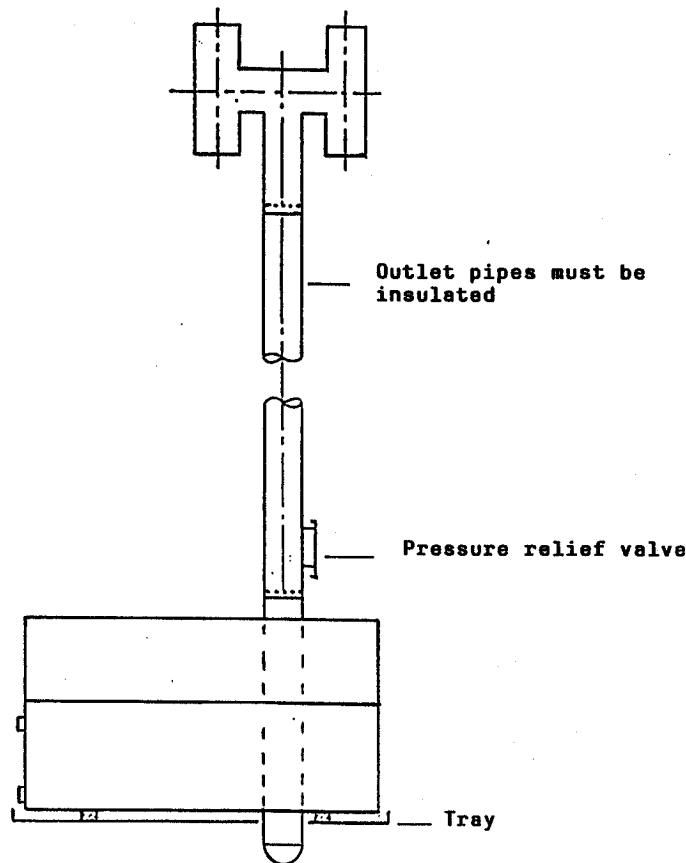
shows a basic plan for the installation of ventilation pipes.
